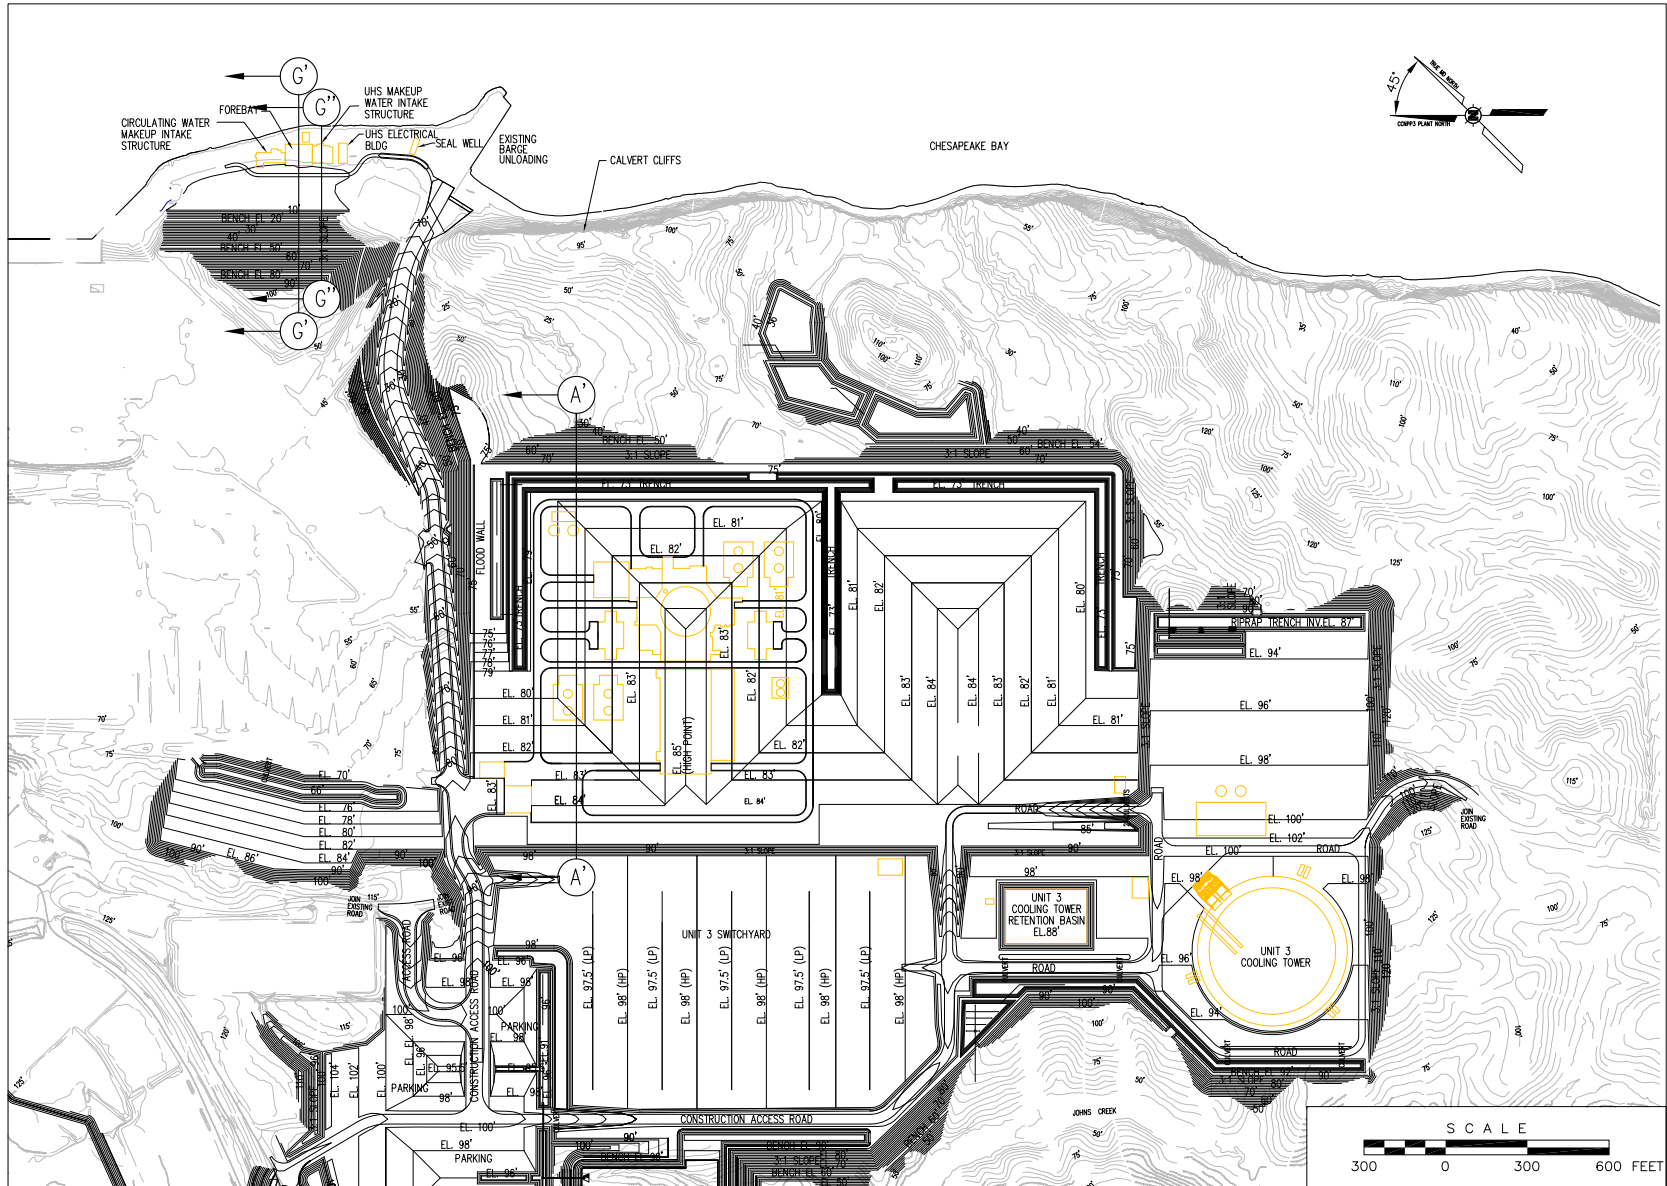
{Excavation Cross-sections in CCNPP Unit 3}
